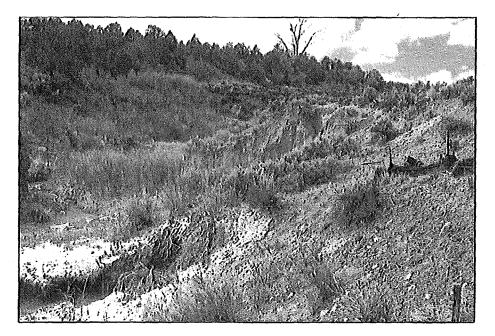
Looking upstream of leak site and hillside to the east where the site will be accessed.
